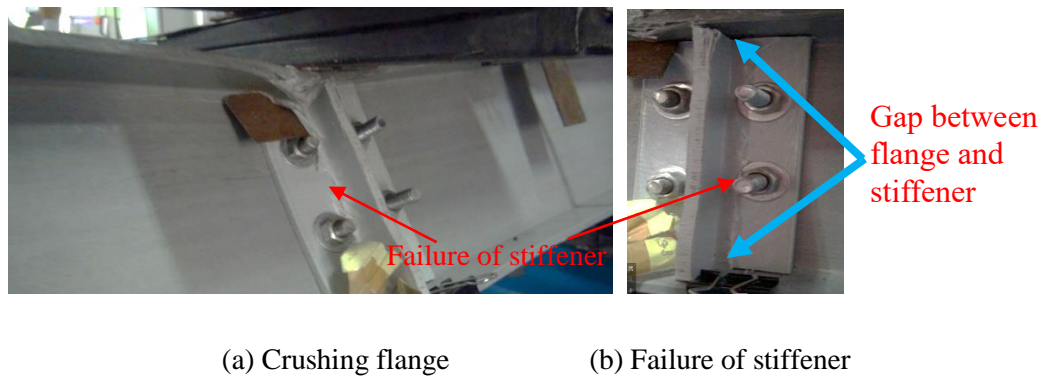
Failure mode of FRP I-beam (7B-TS-F-B beam) with T-shaped stiffener.
